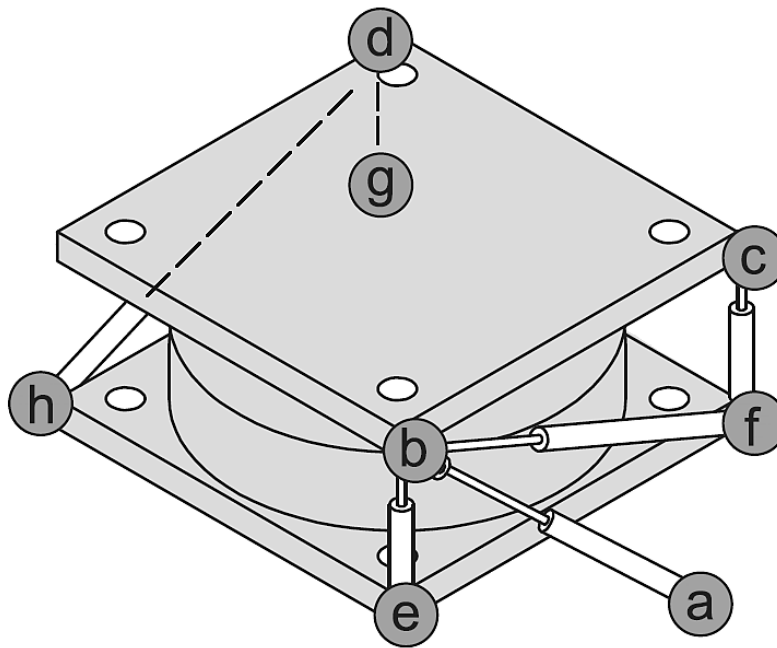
Instrumentation arrangement for measuring displacements of FPS bearings.
